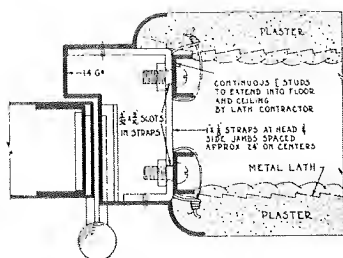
Flush Combined Metal Frame and Trim with Plaster Mould.
